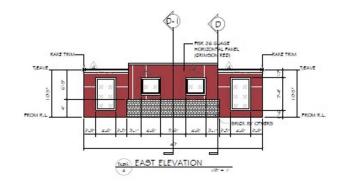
EXHIBIT C – FAUX WINDOW DETAIL Building 1
